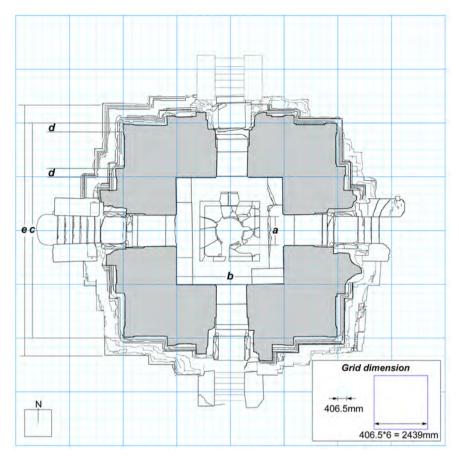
Plan of the central shrine (N1) of Prasat Sambor.
